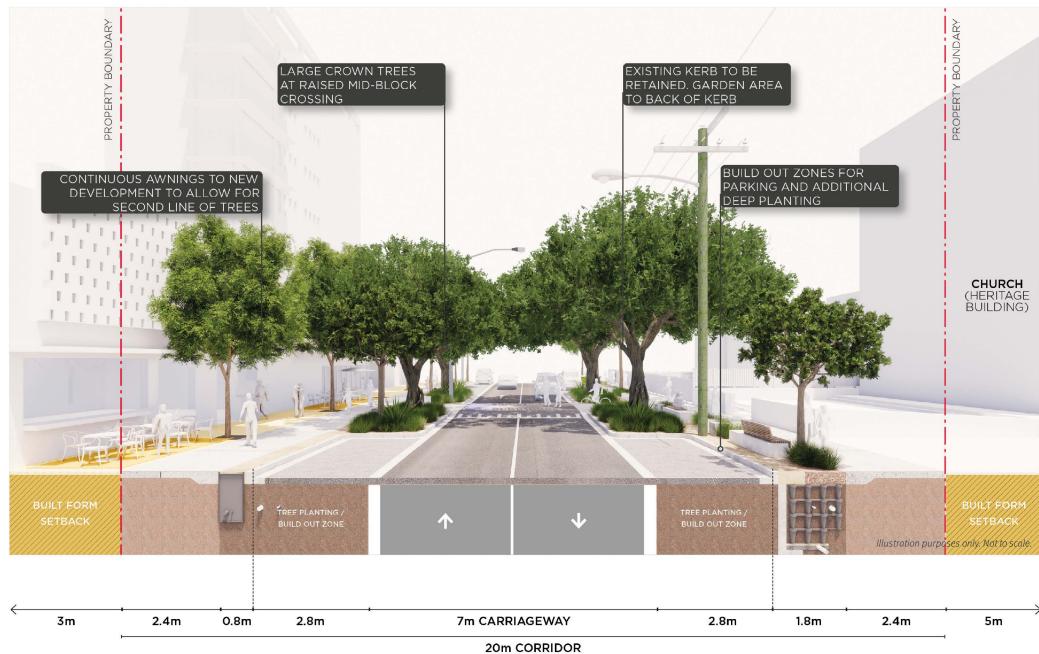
Cross section - Hawthorne Street - subtropical boulevard (minor)
